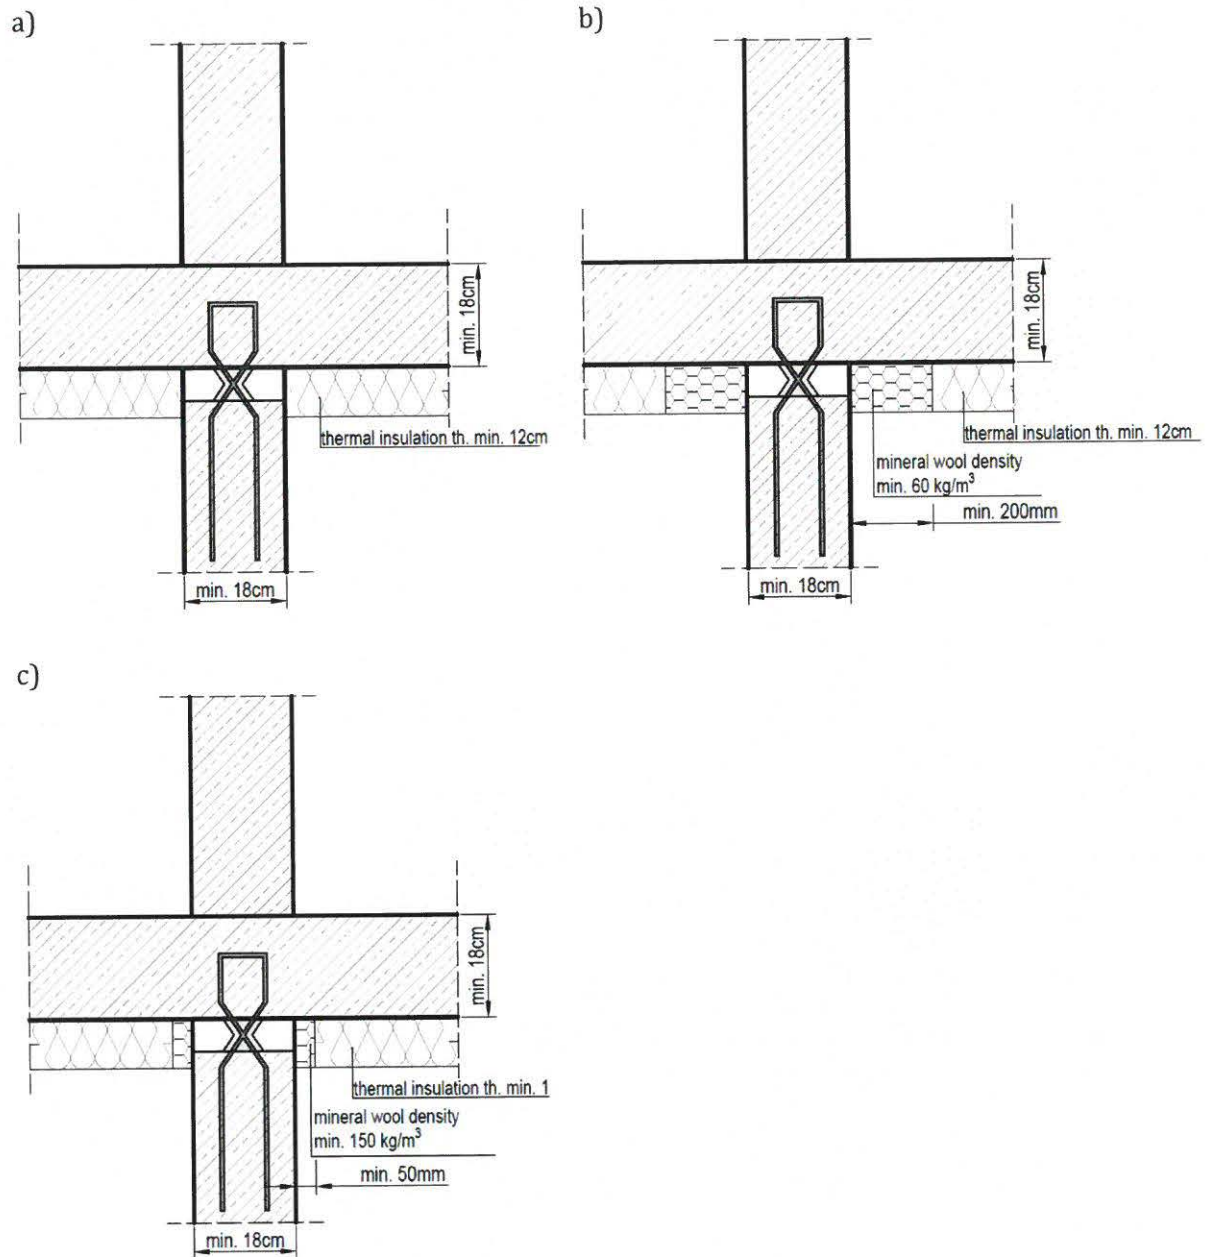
Internal wall and floor connection with Schöck Alphadock / Sconnex Typ W
